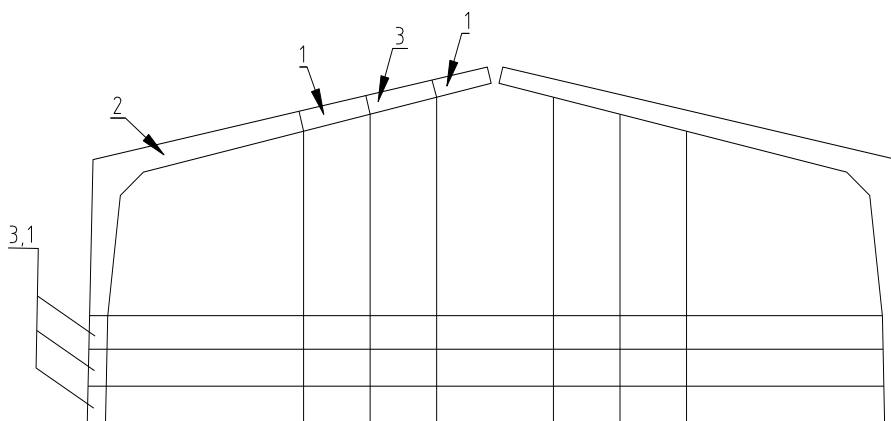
Generalized dimensional diagram of three-hinged frames formed by half-frames with combined elements:
